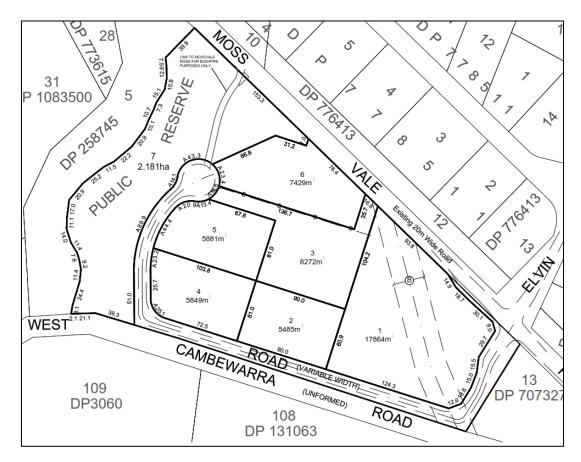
Approved Subdivision Plan (Allen Price and Scarratts)
